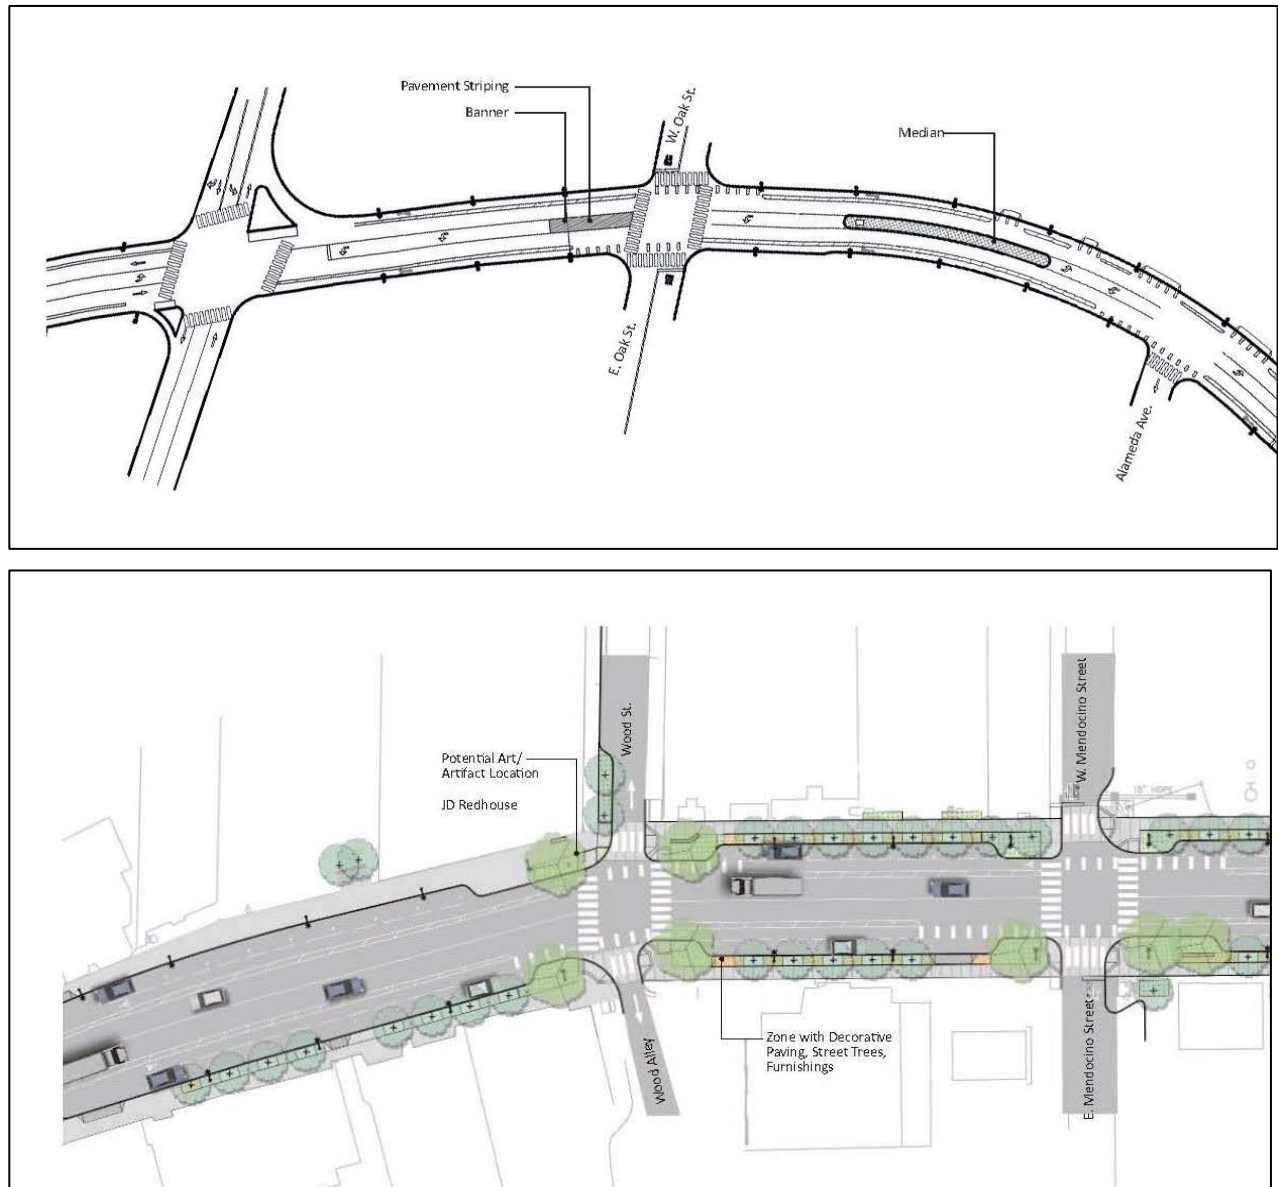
Conceptual Illustrative Plans, Oak Street to Valley Street (top) and Wood Street to Commercial Street (bottom)
